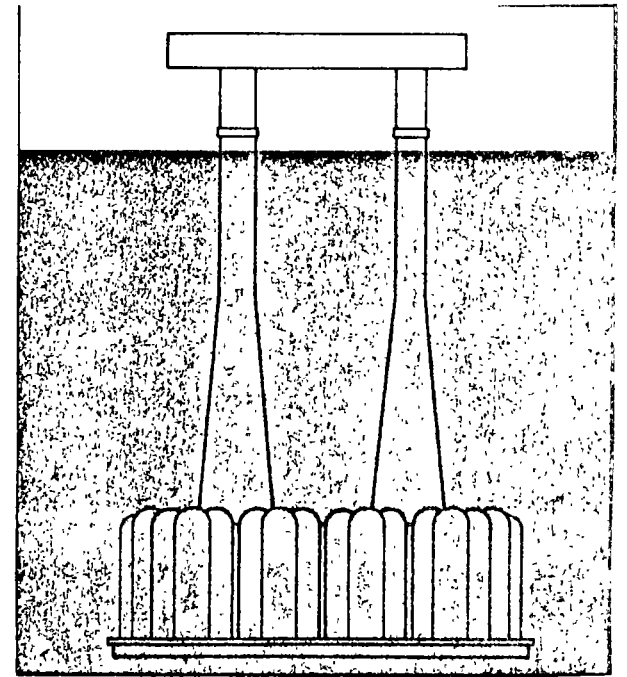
DECK UNIT CONNECTED TO TOWERS
